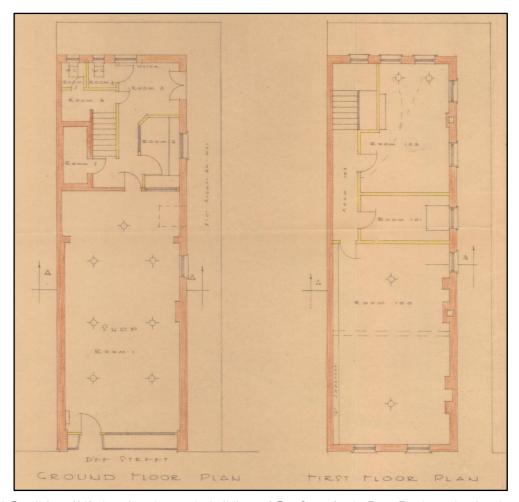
Detail from 1942 alteration plans to the building at 9 Dee Street for the Brass Brothers, showing the alterations to the floor plan of the building (E. Smith, 1942).
